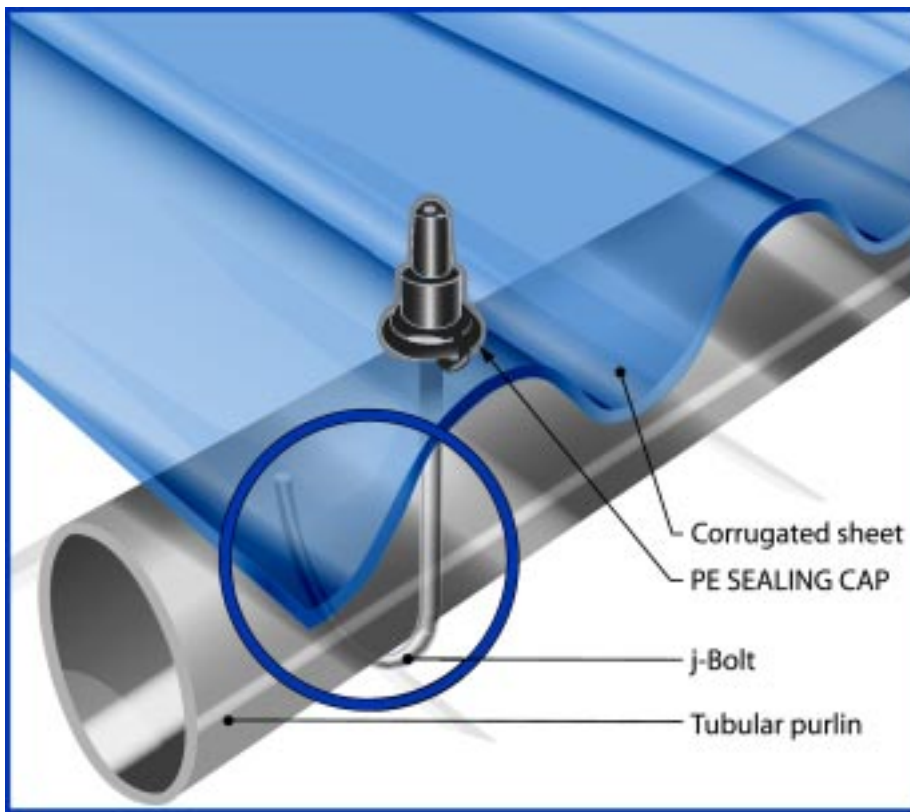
a: Fastening PLEXIGLAS® corrugated sheets using j-bolt and PE SEALING CAP
